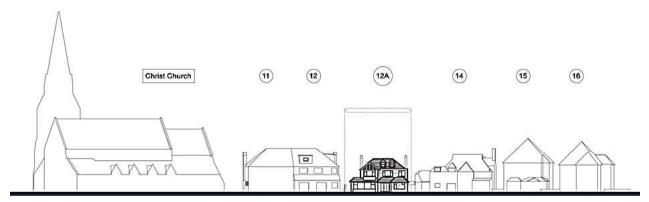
The application site seen within the context of the neighbouring buildings. This view highlights the considerable difference in scale of between the application site and the surrounding buildings.
